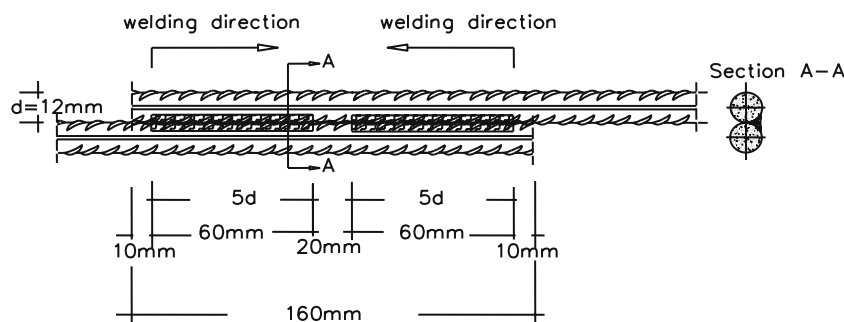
Schematic of direct lap joint of reinforcing steel specimens
